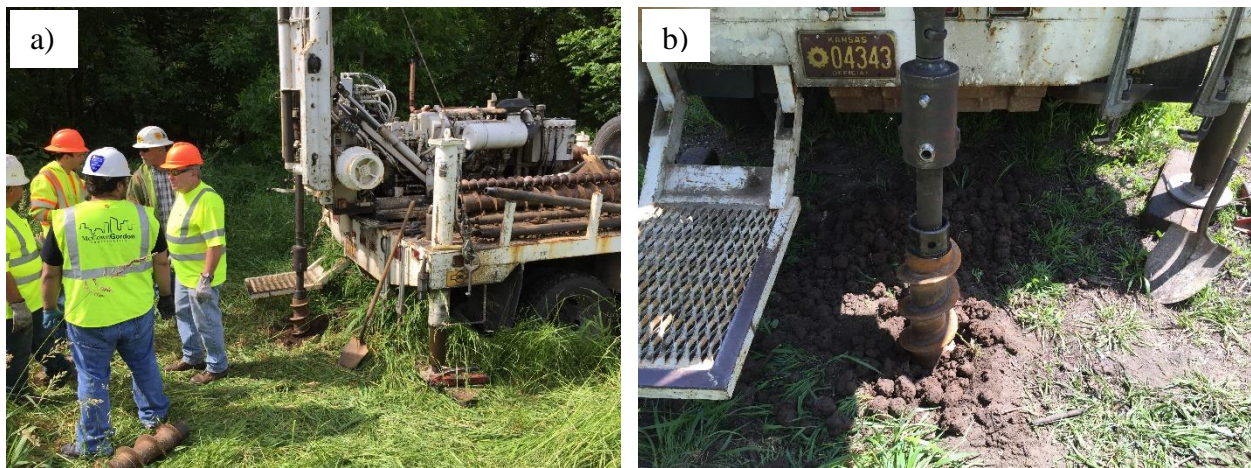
a) Sample drilling with the drill rig; b) close view of drilling
